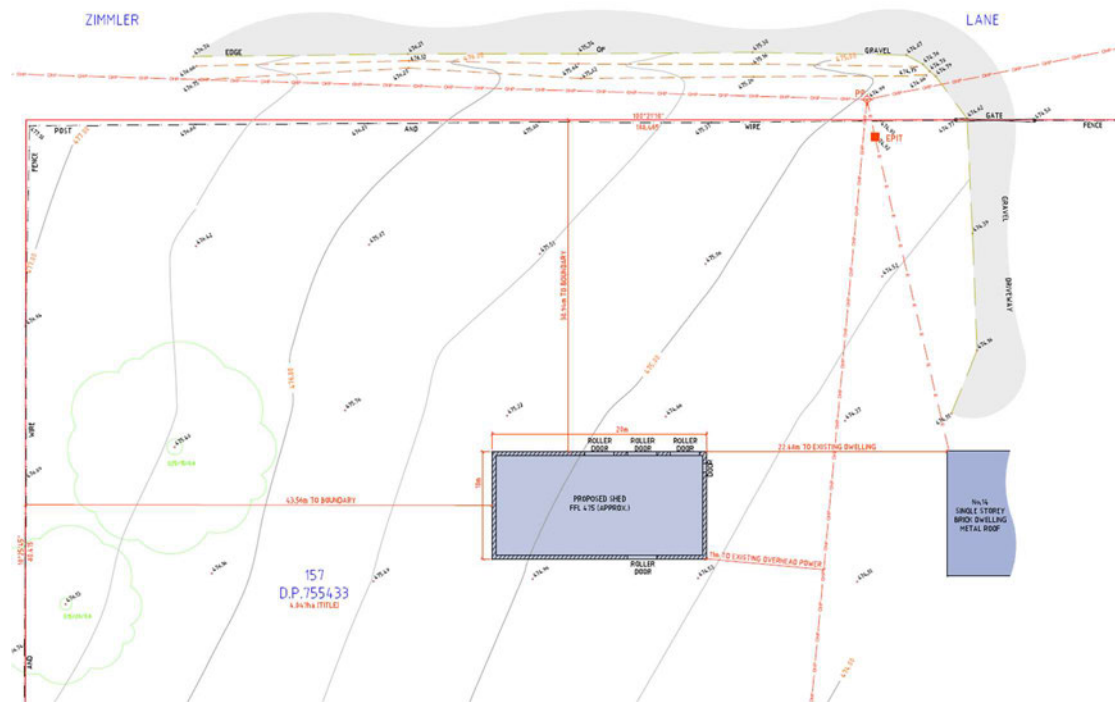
Site Plan (Appendix 3) Identifying the Position of the Proposed Shed on the Site.
